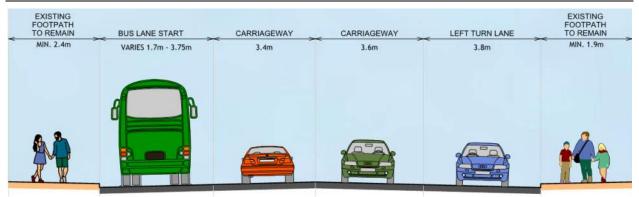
Section 1 Do Nothing Scenario Cross Section Ballinacurra Rd at Left Turn Lane into Crescent
